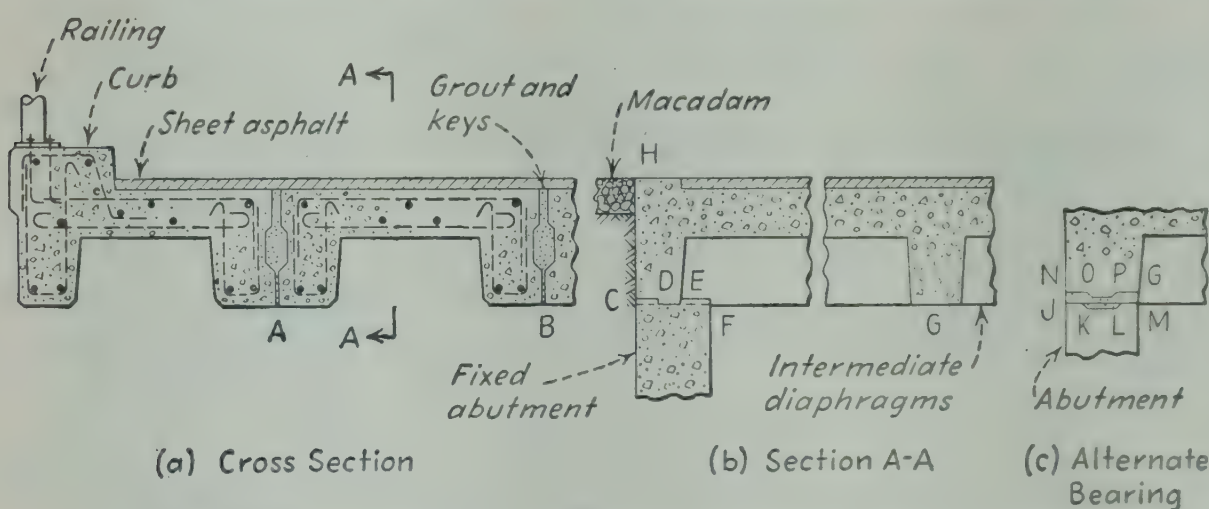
Some details for a short precast-concrete highway bridge.
